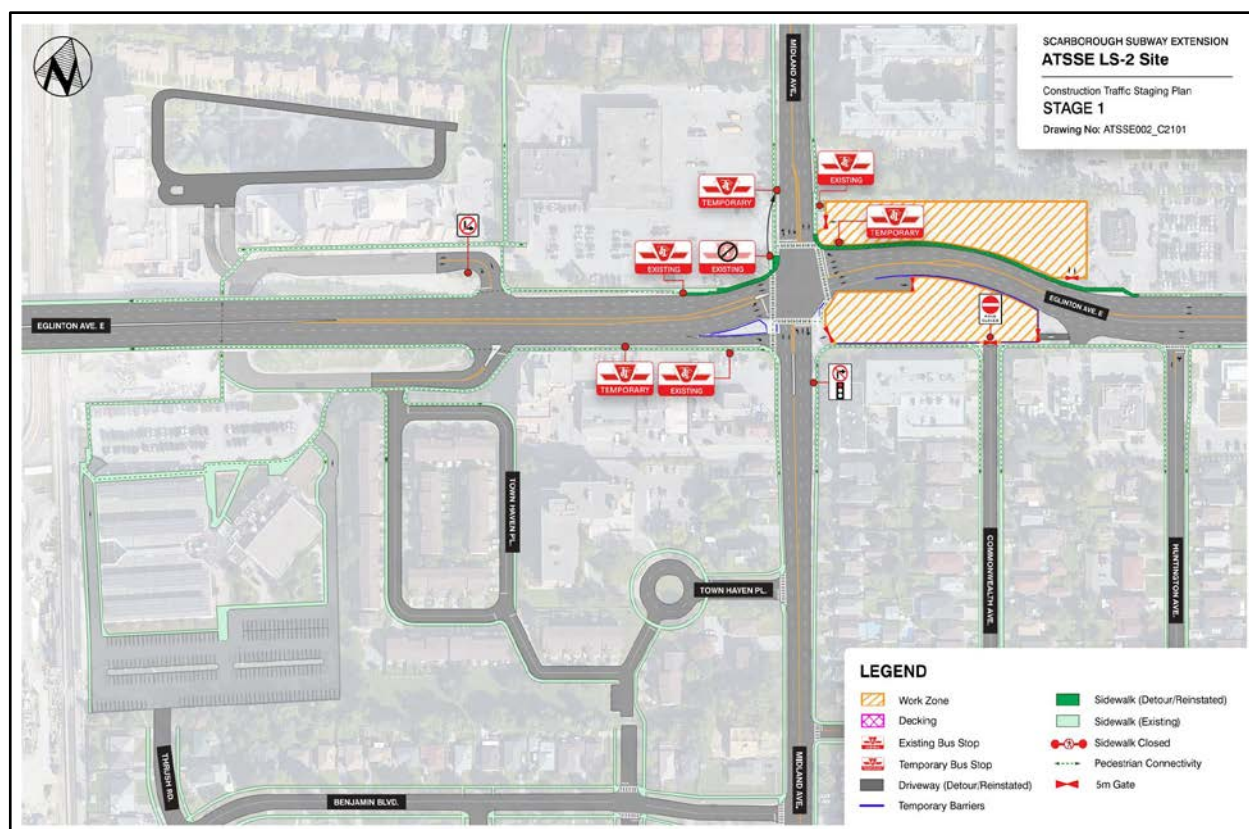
SSE LS-2 Site Layout and Diversion Road
